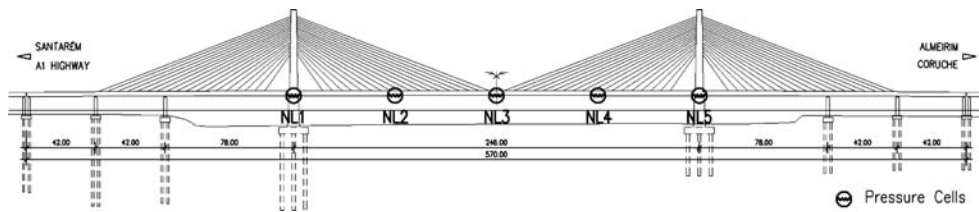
Longitudinal section of Salgueiro Maia cable-stayed bridge and hydrostatic levelling system.
